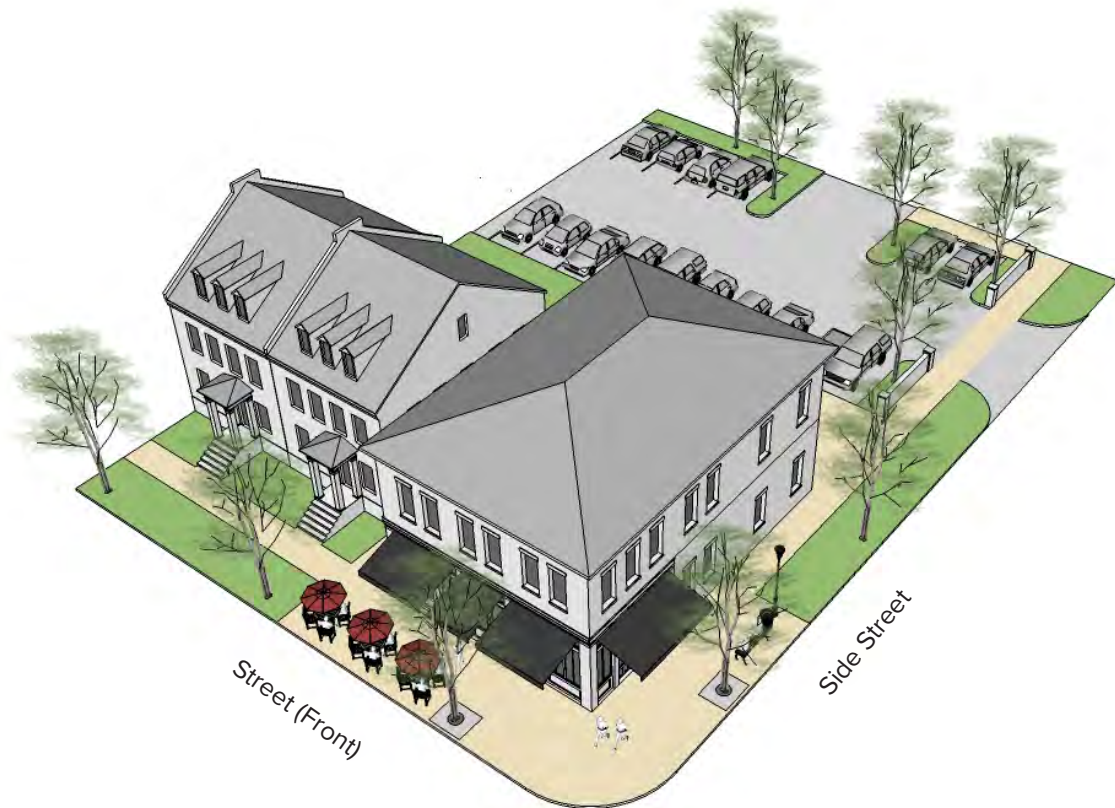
Illustrative example of buildings and site arrangement in the T4 General Zone.
